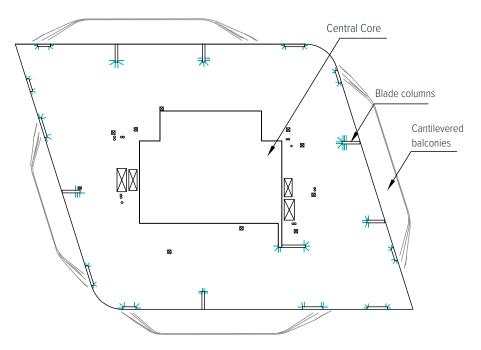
STRUCTURAL LAYOUT OF A TYPICAL FLOOR AT LIGHTHOUSE, ©RAMBOLL.
